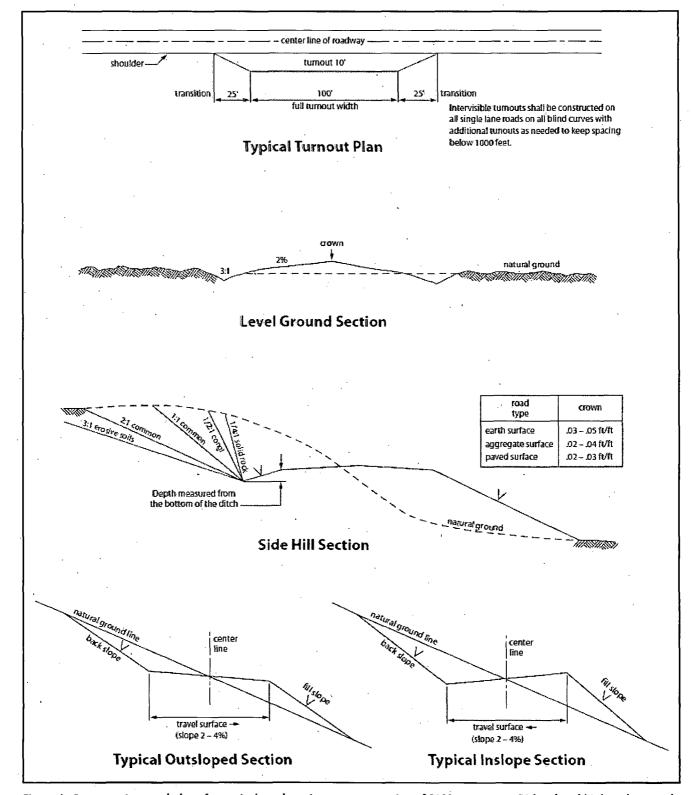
Cross-sections and plans for typical road sections representative of BLM resource or FS local and higher-class roads.
